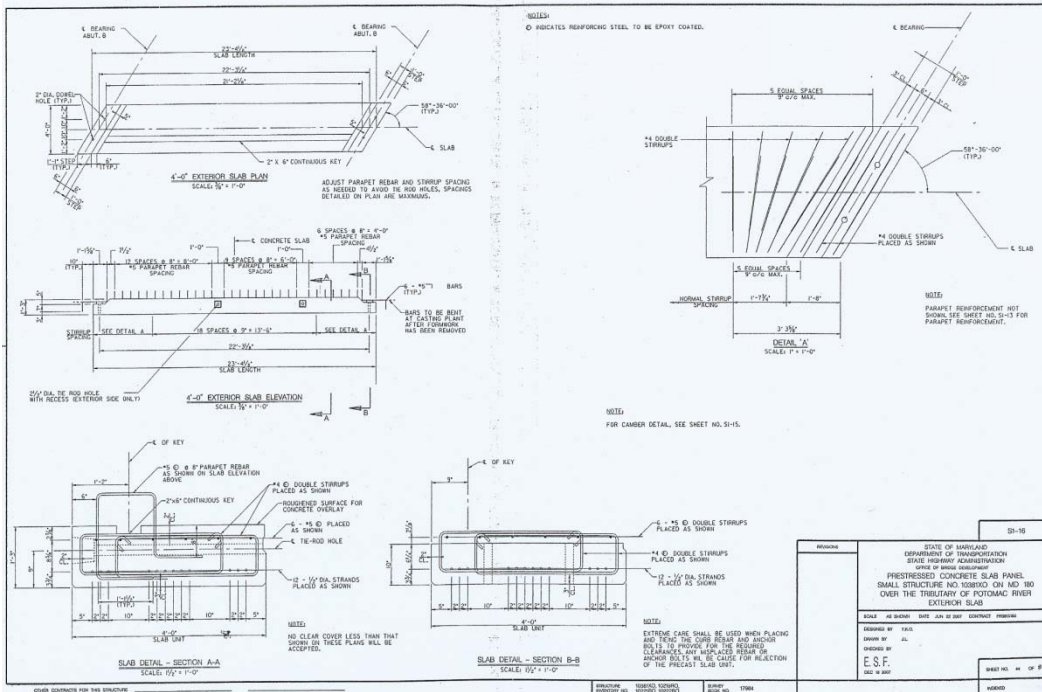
Reinforcement Details of the Knoxville, MD, Bridge
